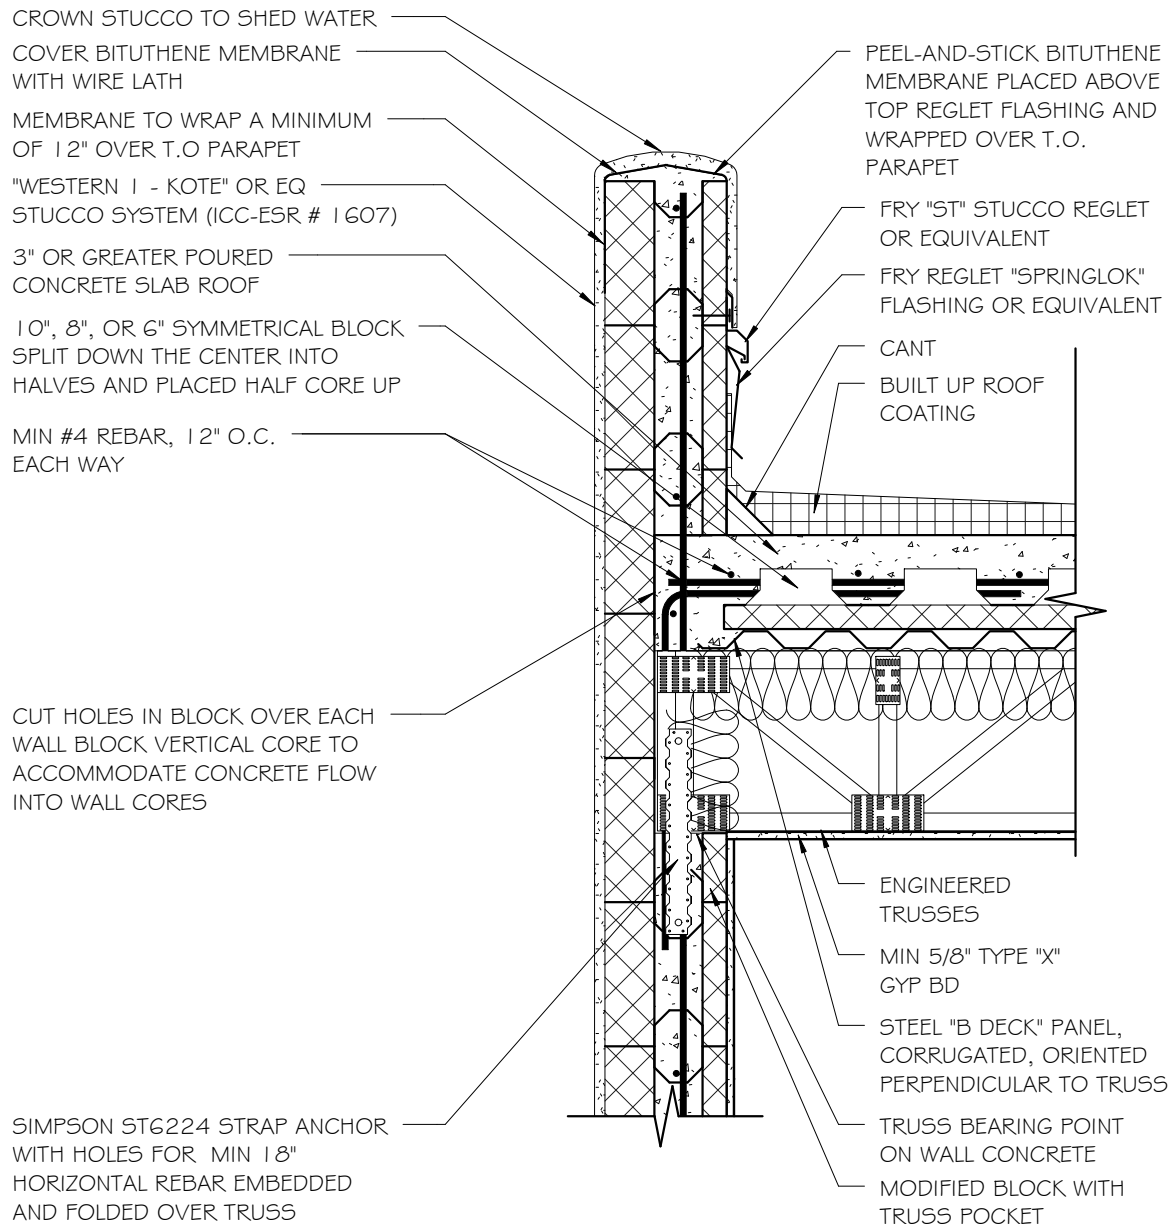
DETAIL FOR ICCF ROOF - FULL BLOCK -
